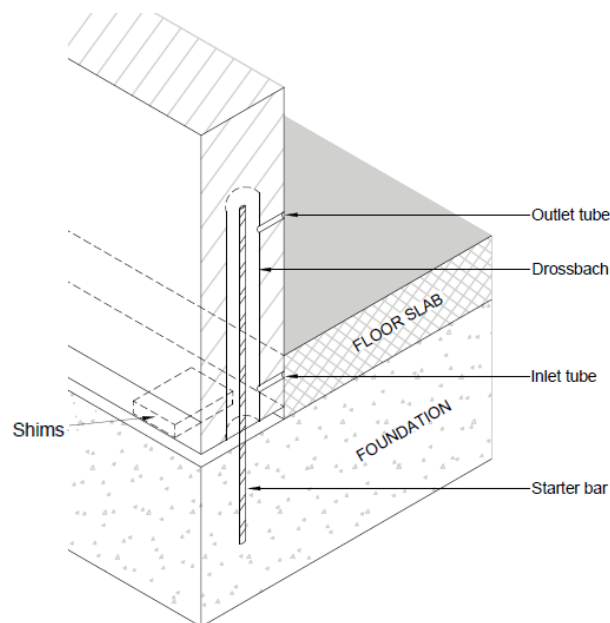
Diagram showing the potential water entry into an ungrouted void between a precast wall and the top of the supporting foundation
